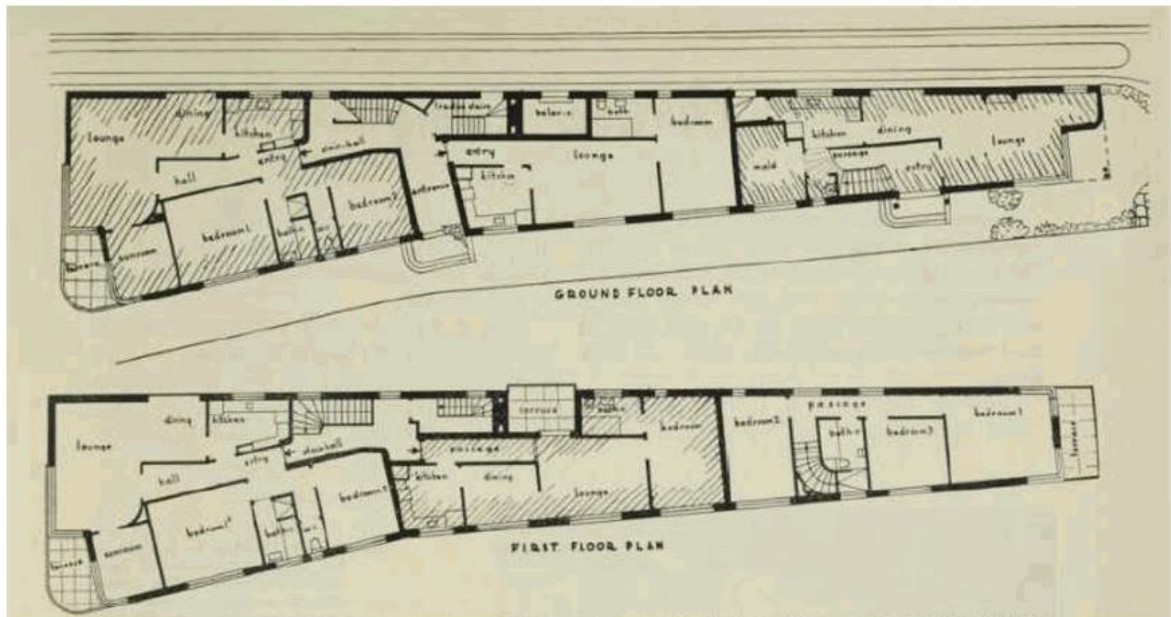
The building's floor plan shortly after completion as published in *Decoration and Glass*, Vol.15 No.2 (July-August 1949), p.25
